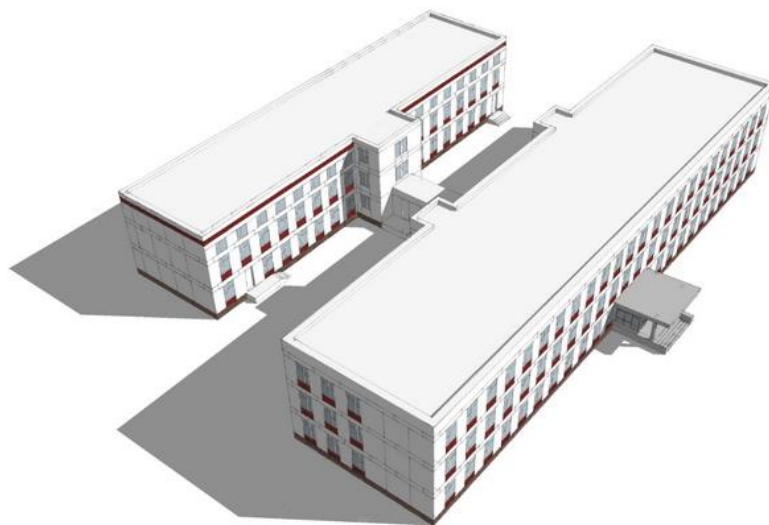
Typical project of school building 65–426/1 ([Past school buildings: typical designs, 2009](#)).
